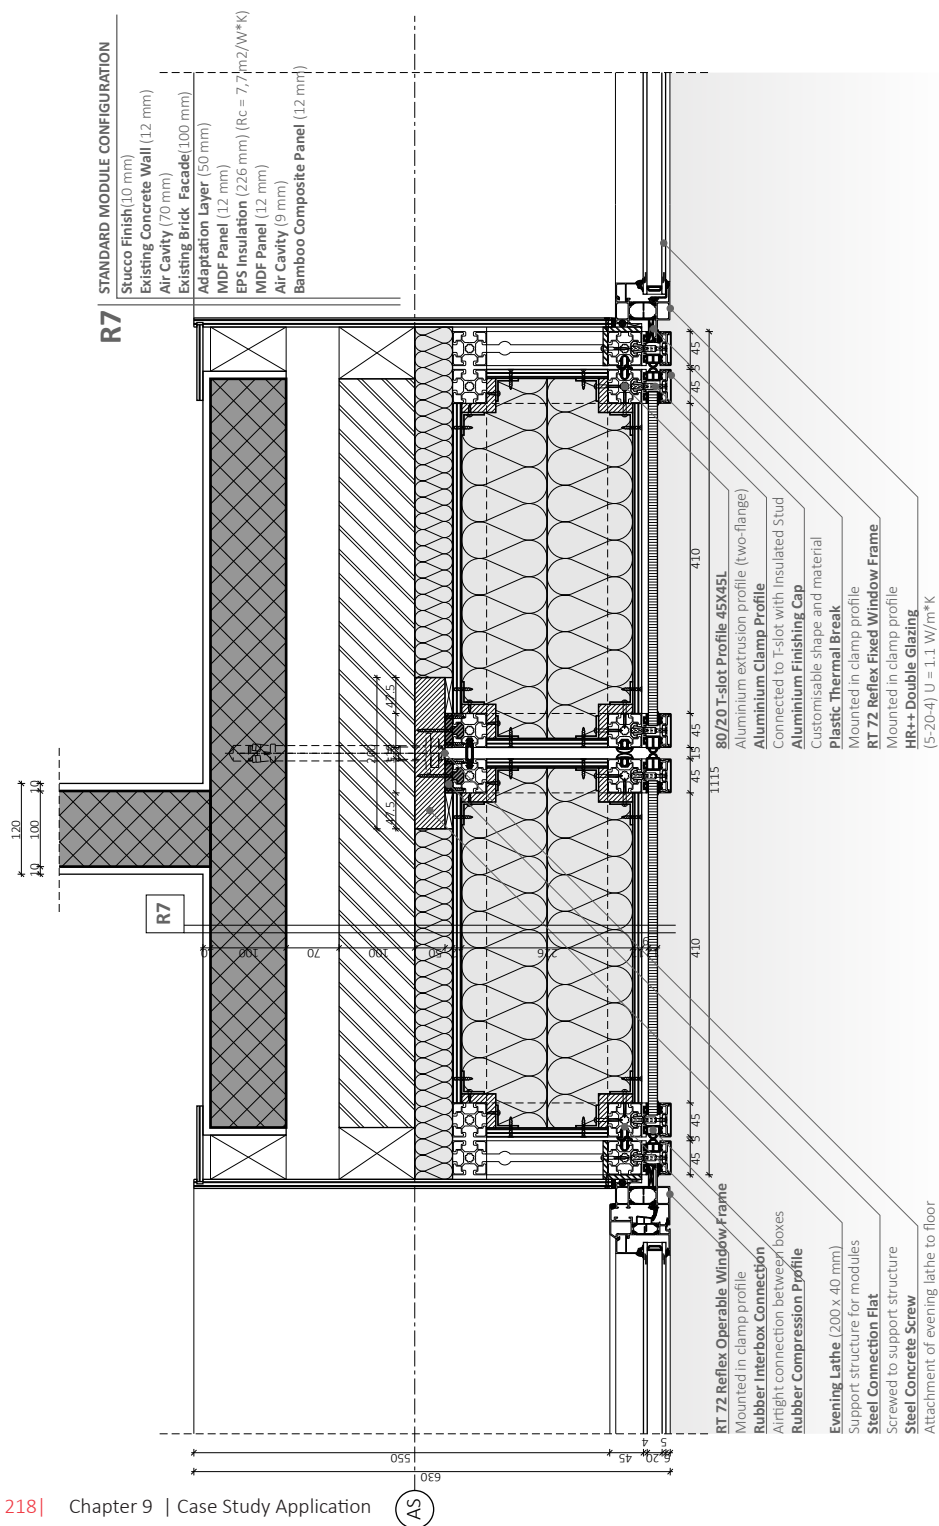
Detail / 1:10 / Horizontal / Module Connection (own illustration).
